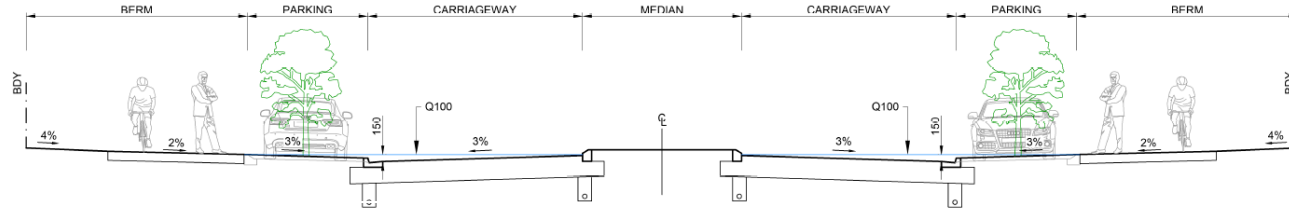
A-6 TYPICAL MINOR ARTERIAL ROAD CROSS SECTION (WHERE SWALE IS NOT REQUIRED)
